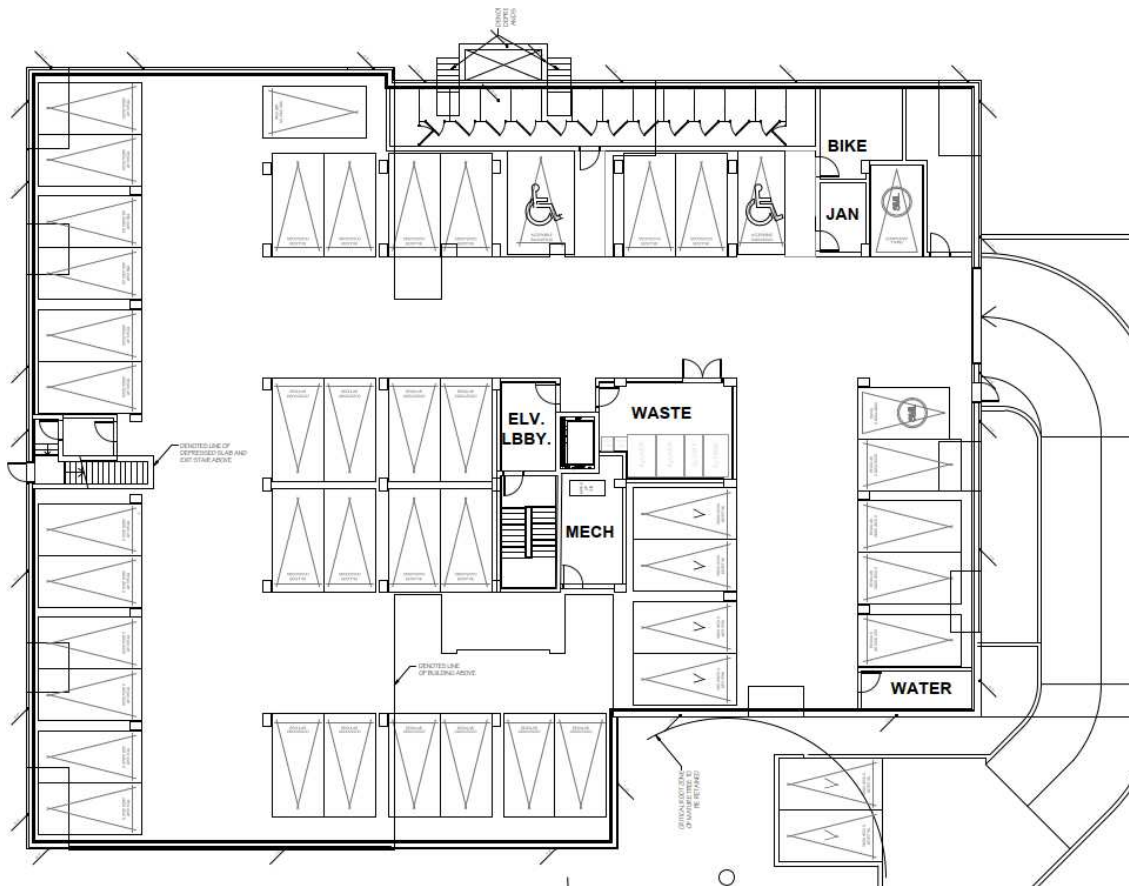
Parking Garage Floor (Source: Hobin Architecture).
